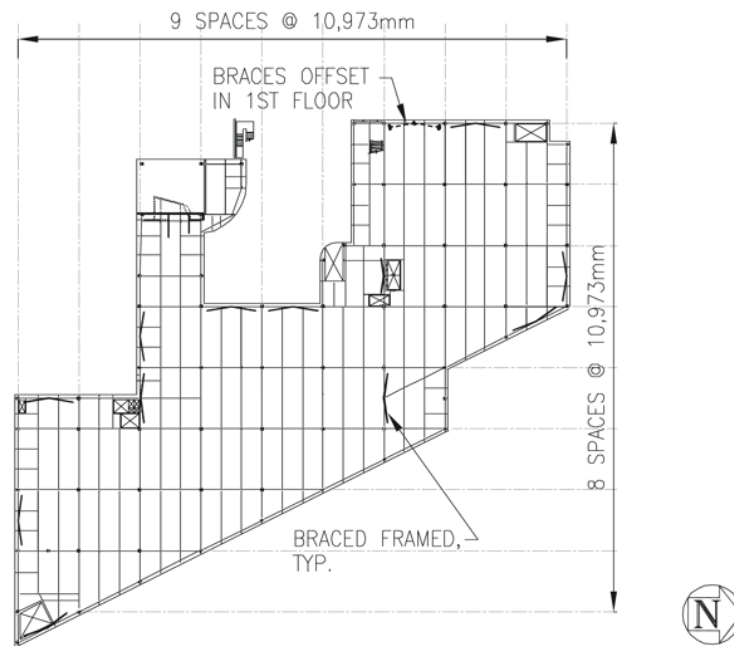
HP Building plan at 2nd story (Kelly et al. 2000)
